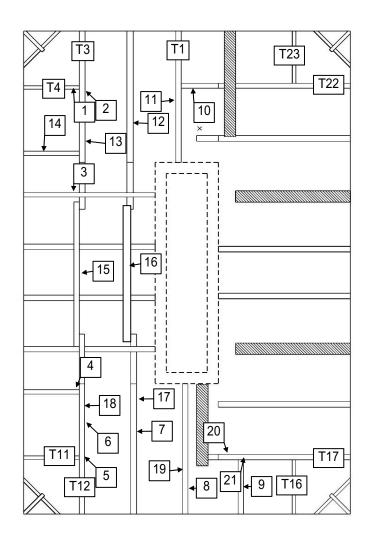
Lytham Hall roof truss numbering scheme TI-T23, with TI at the centre of the north side and each truss or half-truss numbered in a sequence running anti-clockwise. The approximate locations of the sampled timbers are marked as arrows. Based on an EH survey drawing. Note trusses TI7-T23 are relatively inaccessible. The T21 tiebeam end (marked x) is the location of Figures 6 and 7
